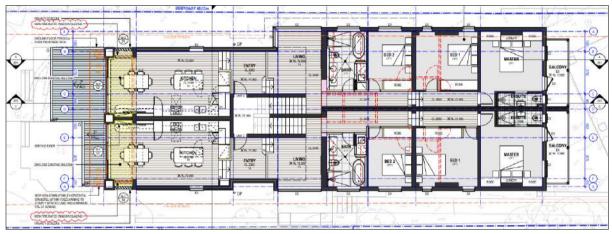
Extract of First Floor of Units 3 and 4 showing area of proposed works
